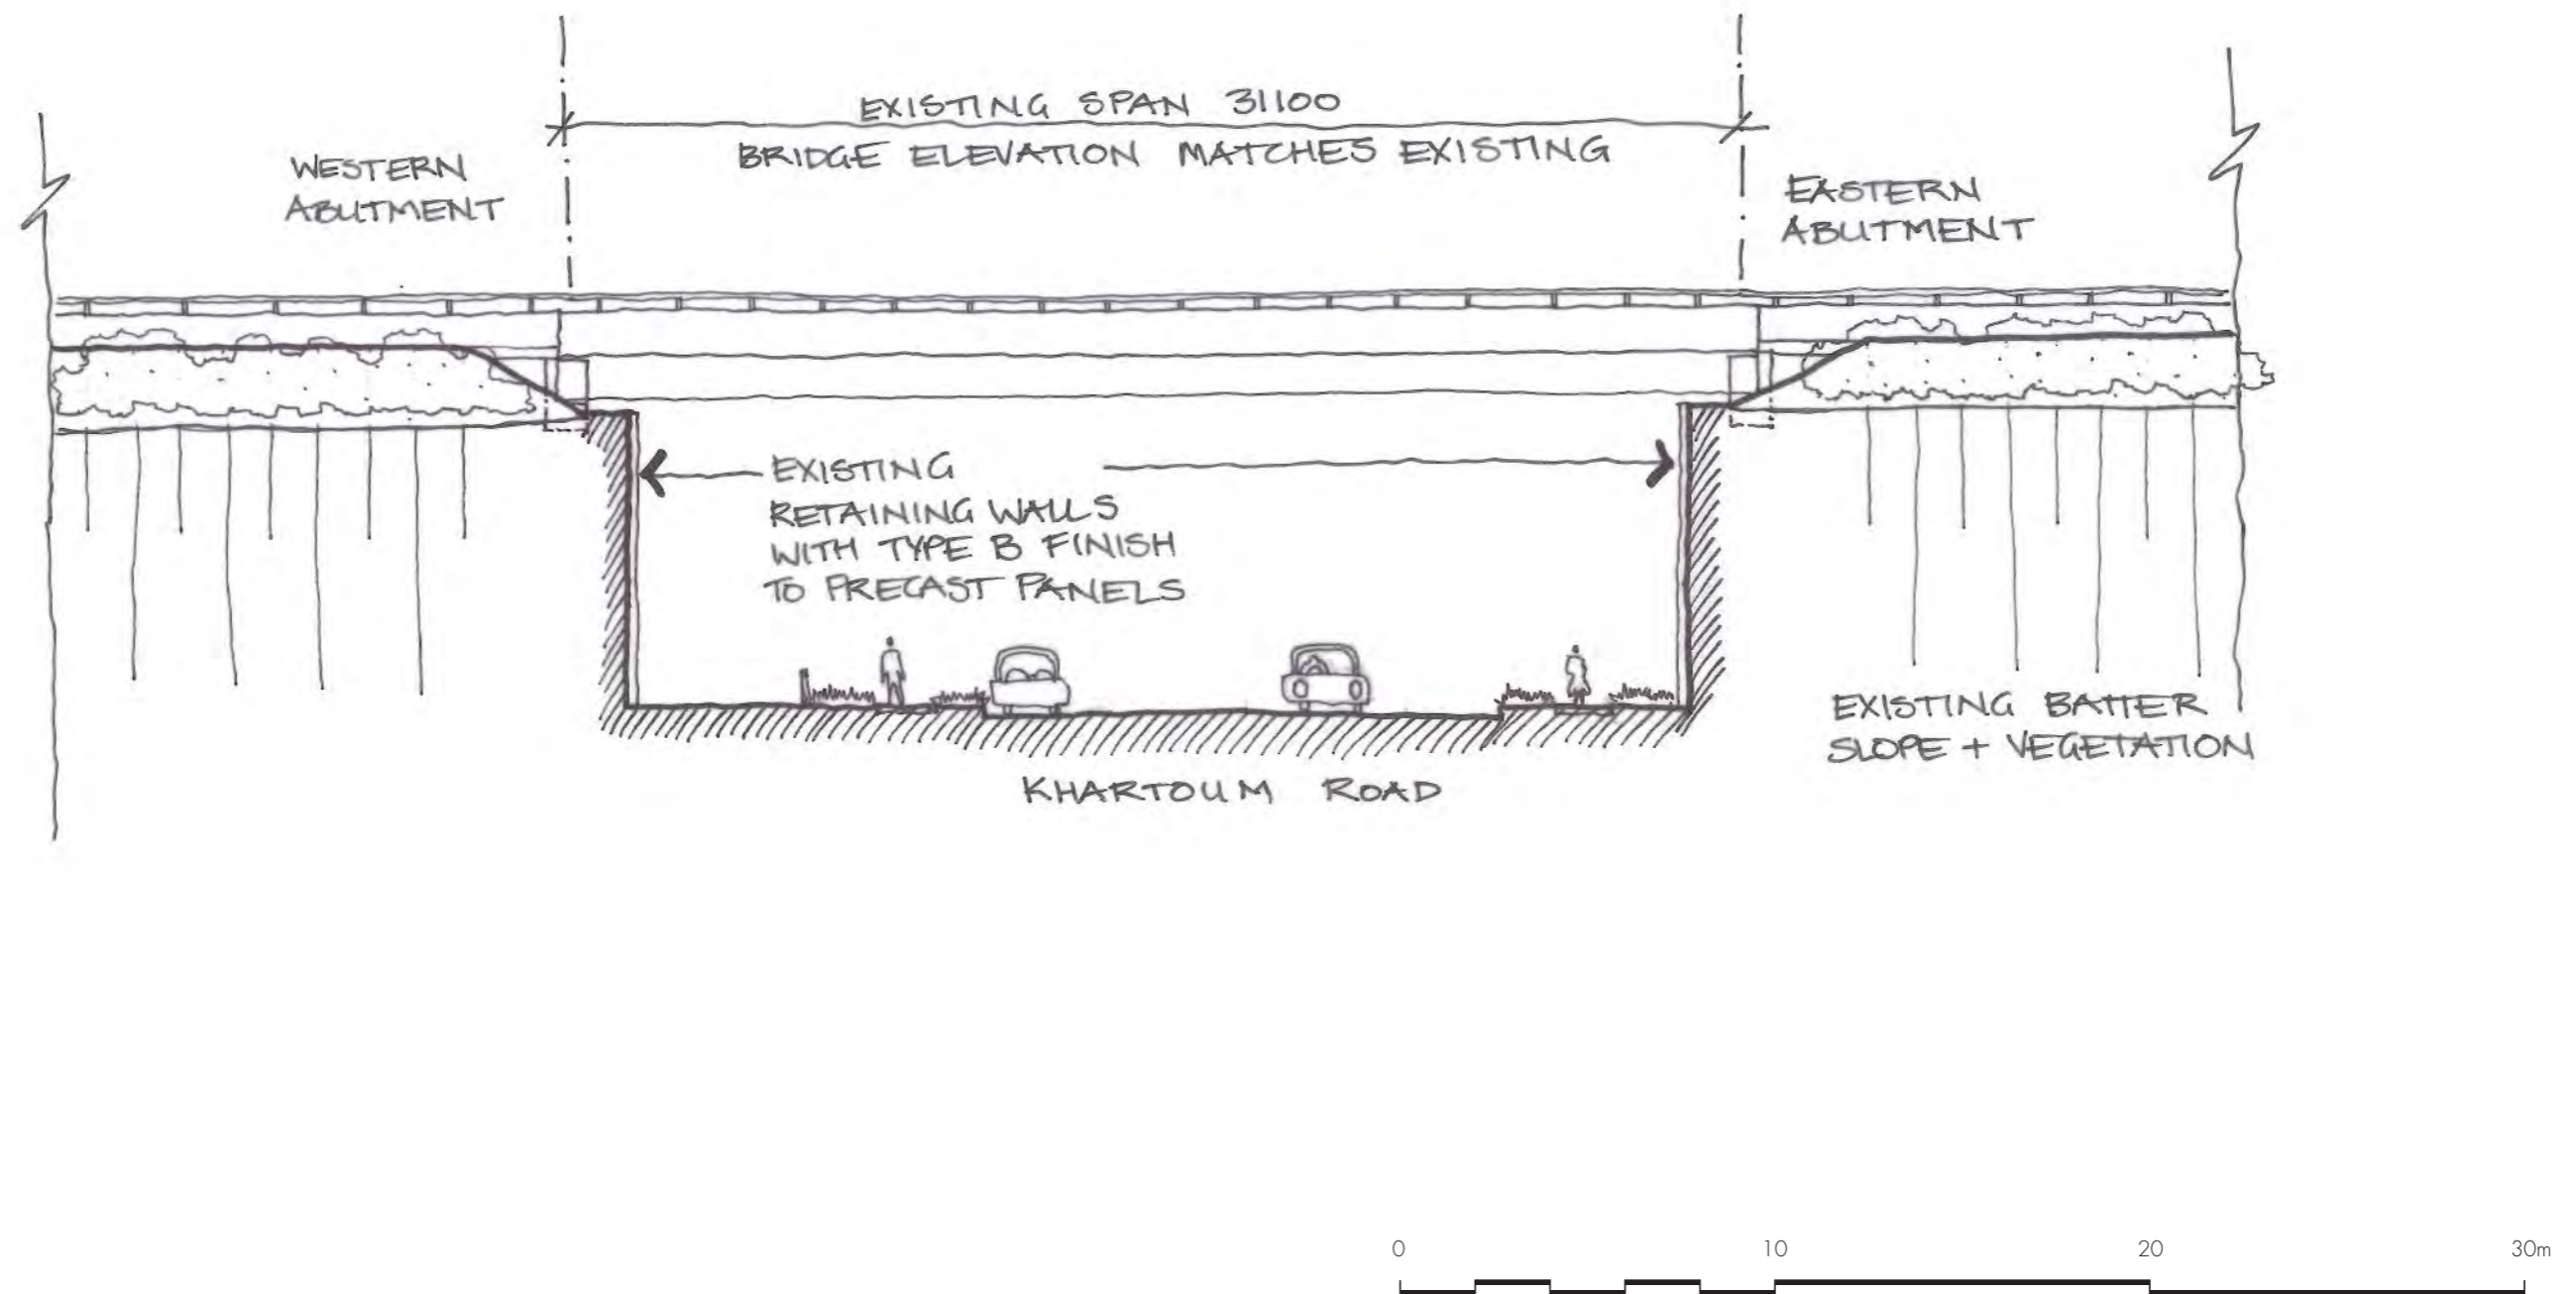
Bridge 6.1 Khartoum Road Bridge - Elevation
